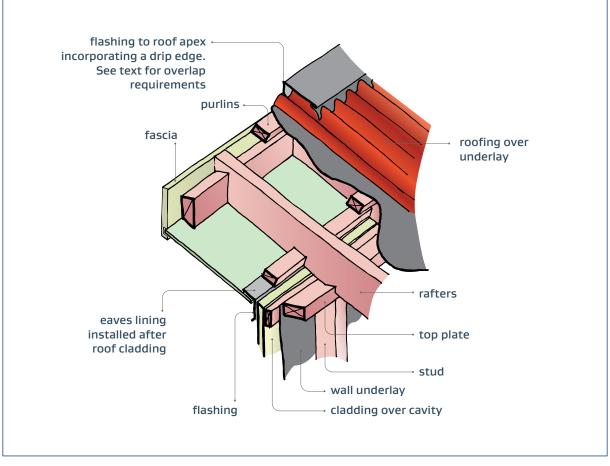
Flashing roof apex for monopitch roof (profiled metal)
